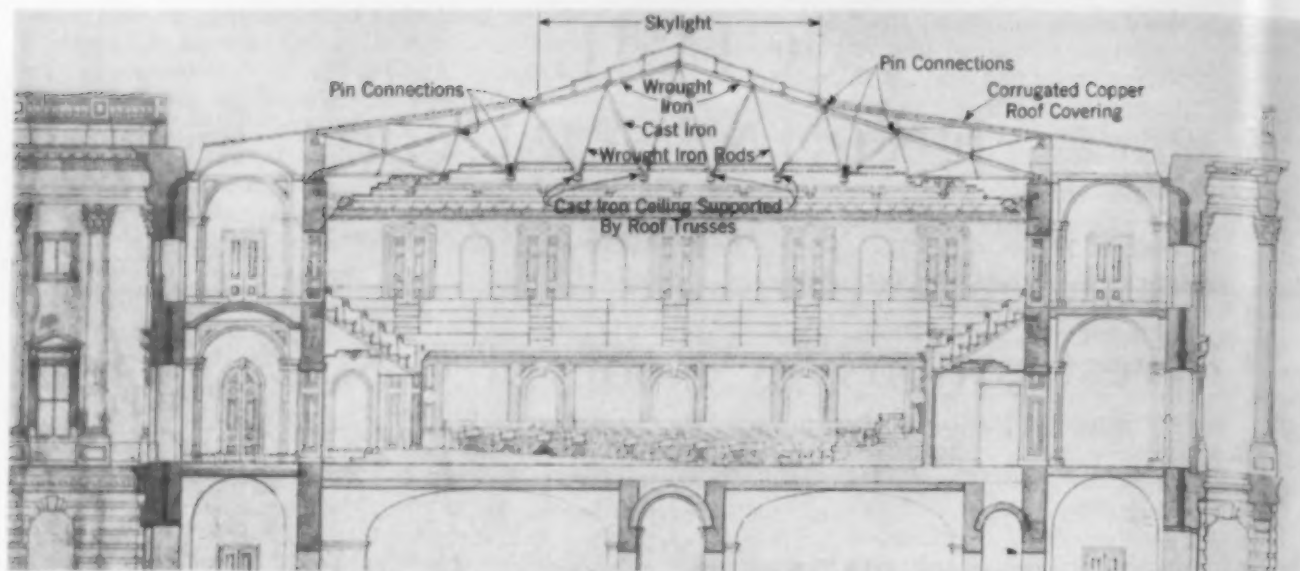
SECTION SHOWING UPPER PORTION OF HOUSE WING, LOOKING EAST
